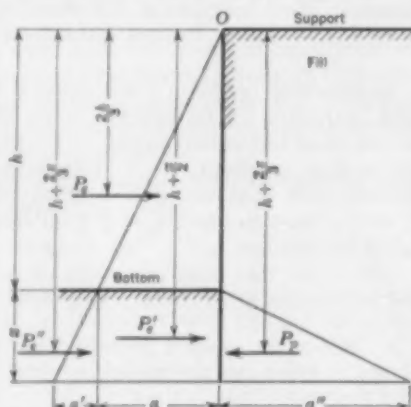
MINIMUM DEPTH OF STEEL SHEET PILING TO PREVENT MOVEMENT AT TOE
